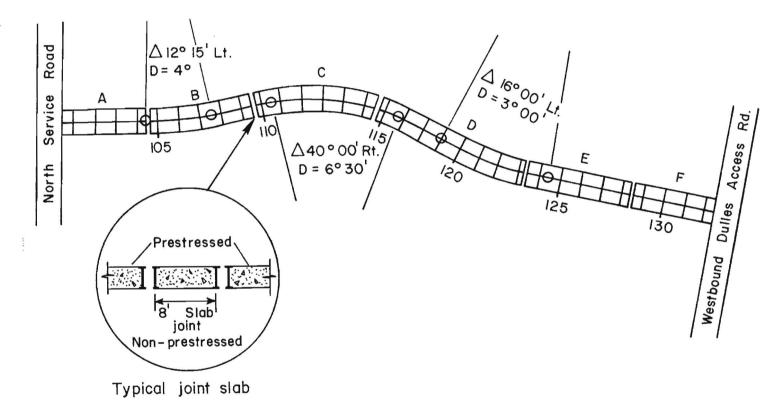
LAYOUT OF PRESTRESSED CONCRETE PAVEMENT AT DULLES INTERNATIONAL AIRPORT, VIRGINIA
